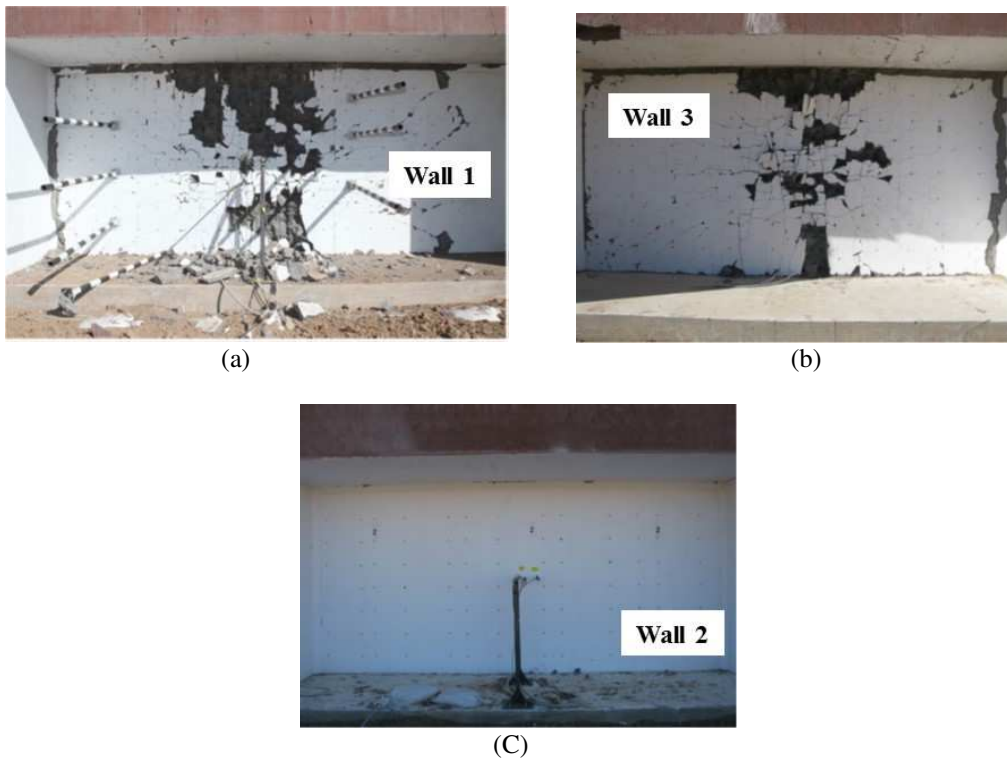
Exterior face of the acceptor panel of (a) Wall 1, (b) Wall 3, and (c) Wall 2 after test [10]
